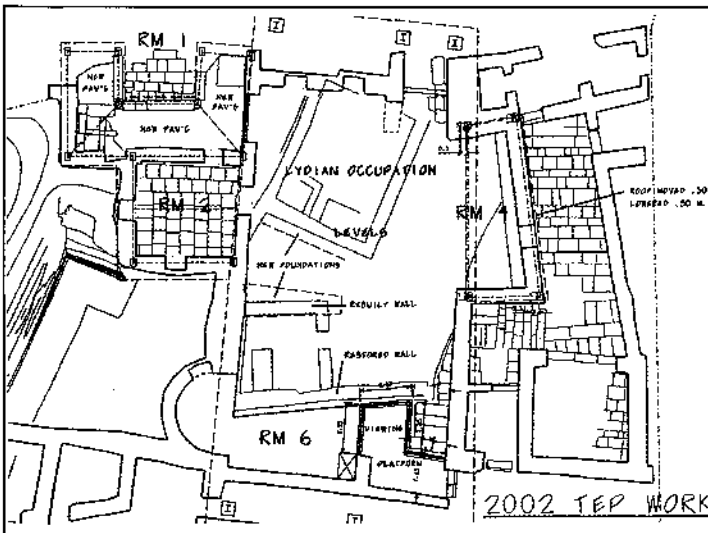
Site enhancement project for Late Roman and Lydian house rooms, sector MMS I, plan
